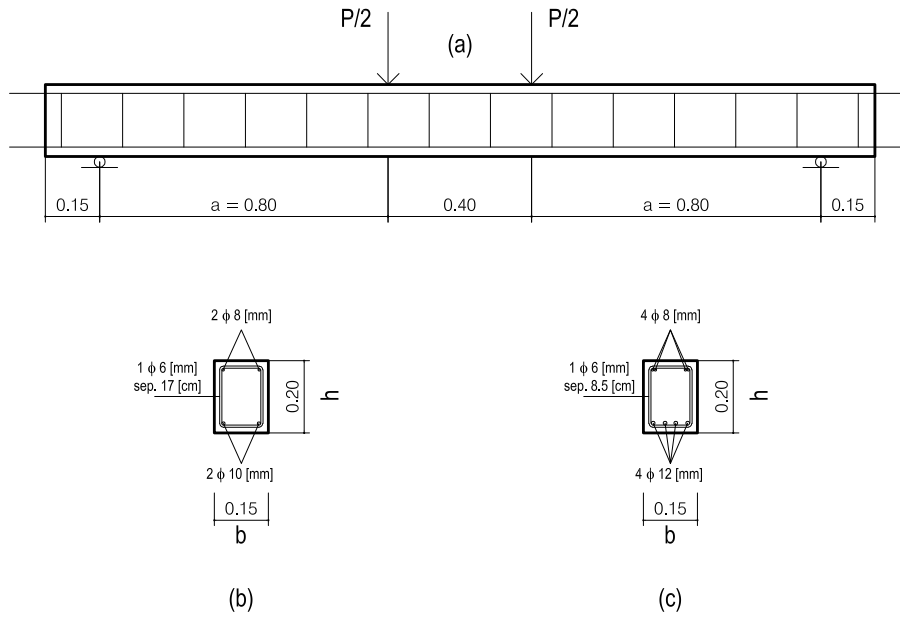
RC beams: (a) Dimensions and boundary conditions (length in [m], except the specified ones). (b) Cross section scheme for beam type 11 ($\approx 0.5\%$ steel-concrete ratio). (c) Cross section scheme for beam type 31 ($\approx 1.5\%$ steel-concrete ratio).
